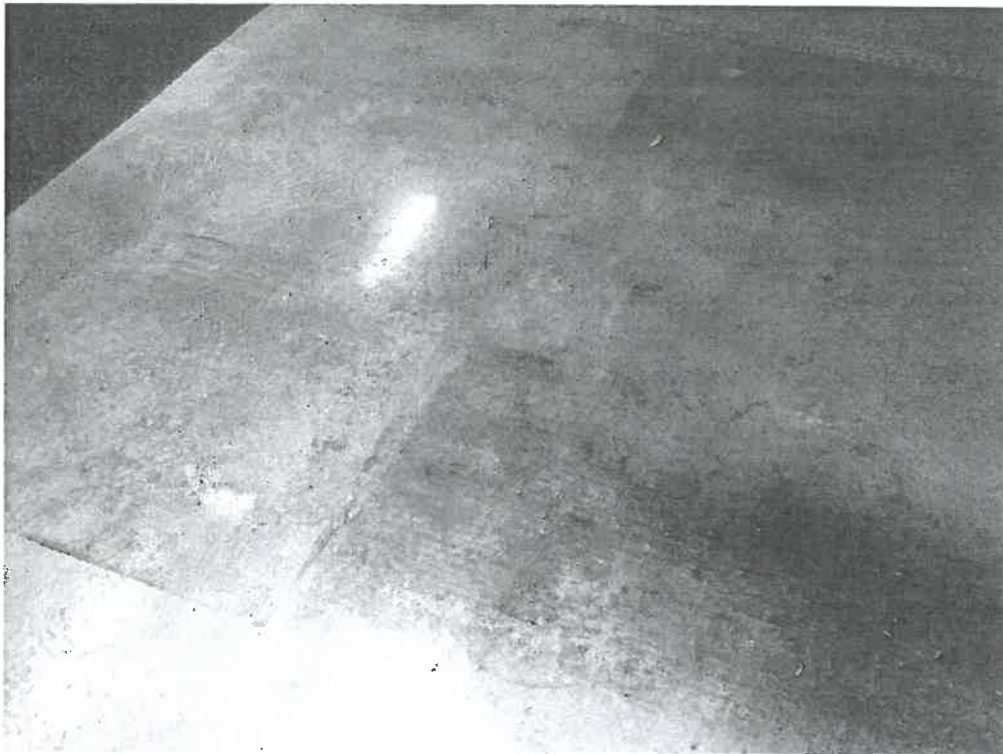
Willatook-Warrong Road Warrong 3282 sec137b report
